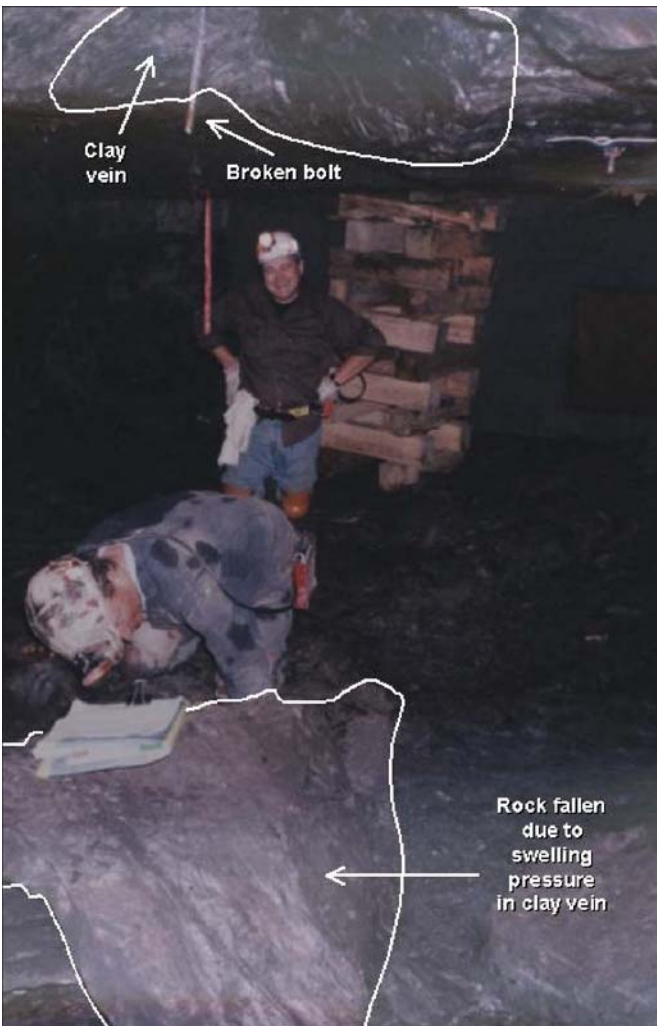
Rock fall occurred when swelling pressures in a roof clay vein broke a roof bolt.
